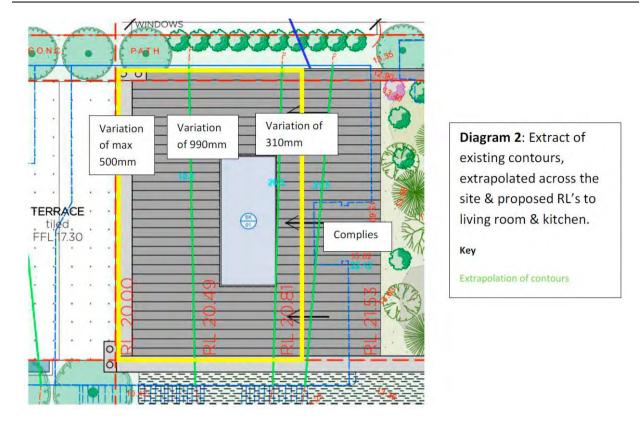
Plan of roof to Level 03 Upper level living room showing existing ground levels (red) and proposed building height (blue) and maximum exceedence measures as "variation"
